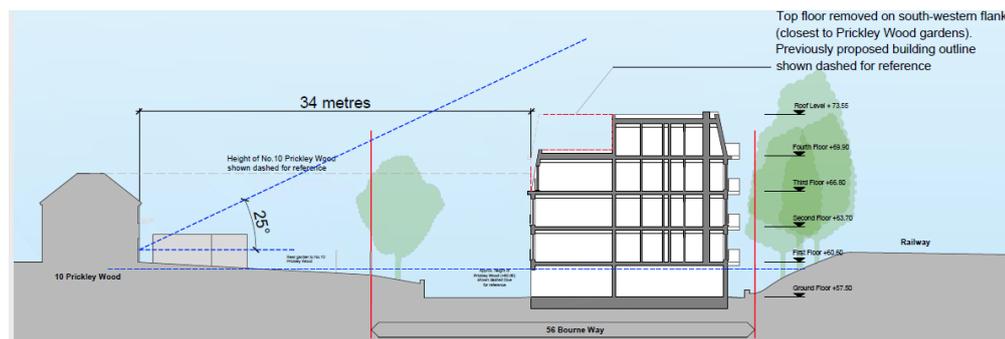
Proposed section drawing - 25 degree line Prickley Wood
